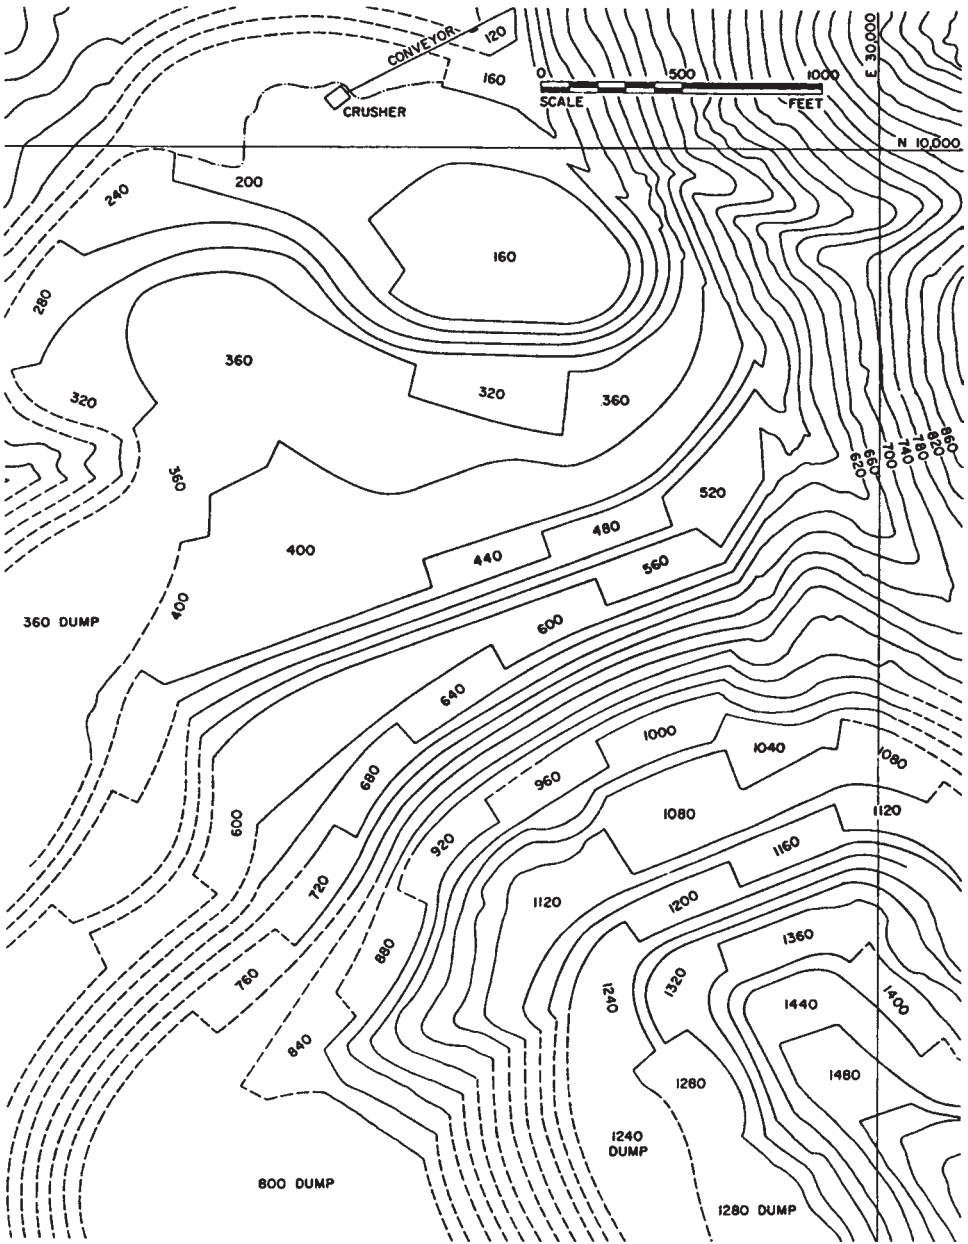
Example mining plan composite map based on midbench contours (Couzens, 1979).
